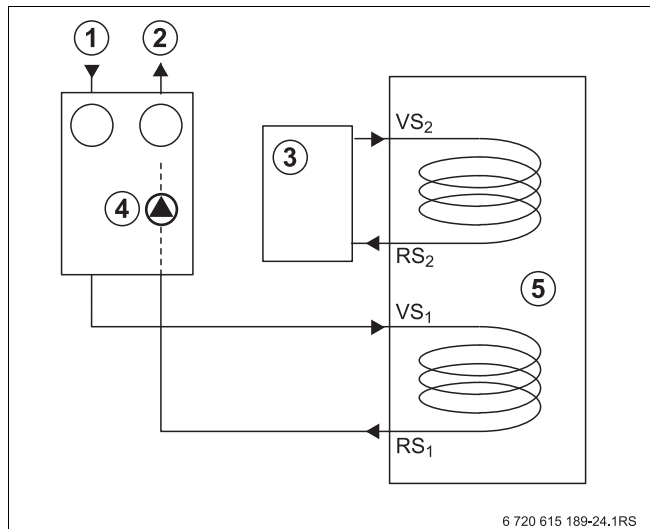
Connecting the KS solar pump station (schematic illustration)
